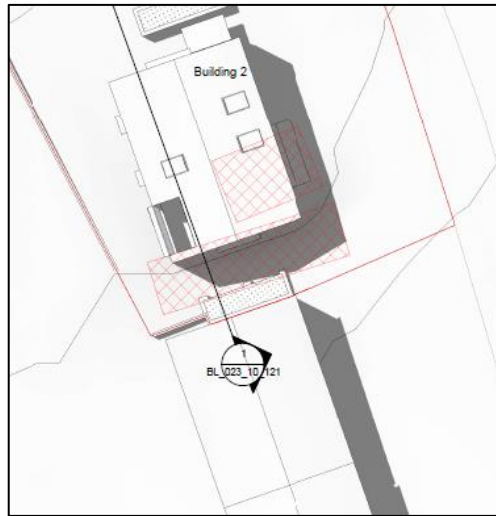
Building 2 to the north of 53 Mount Echo Avenue
